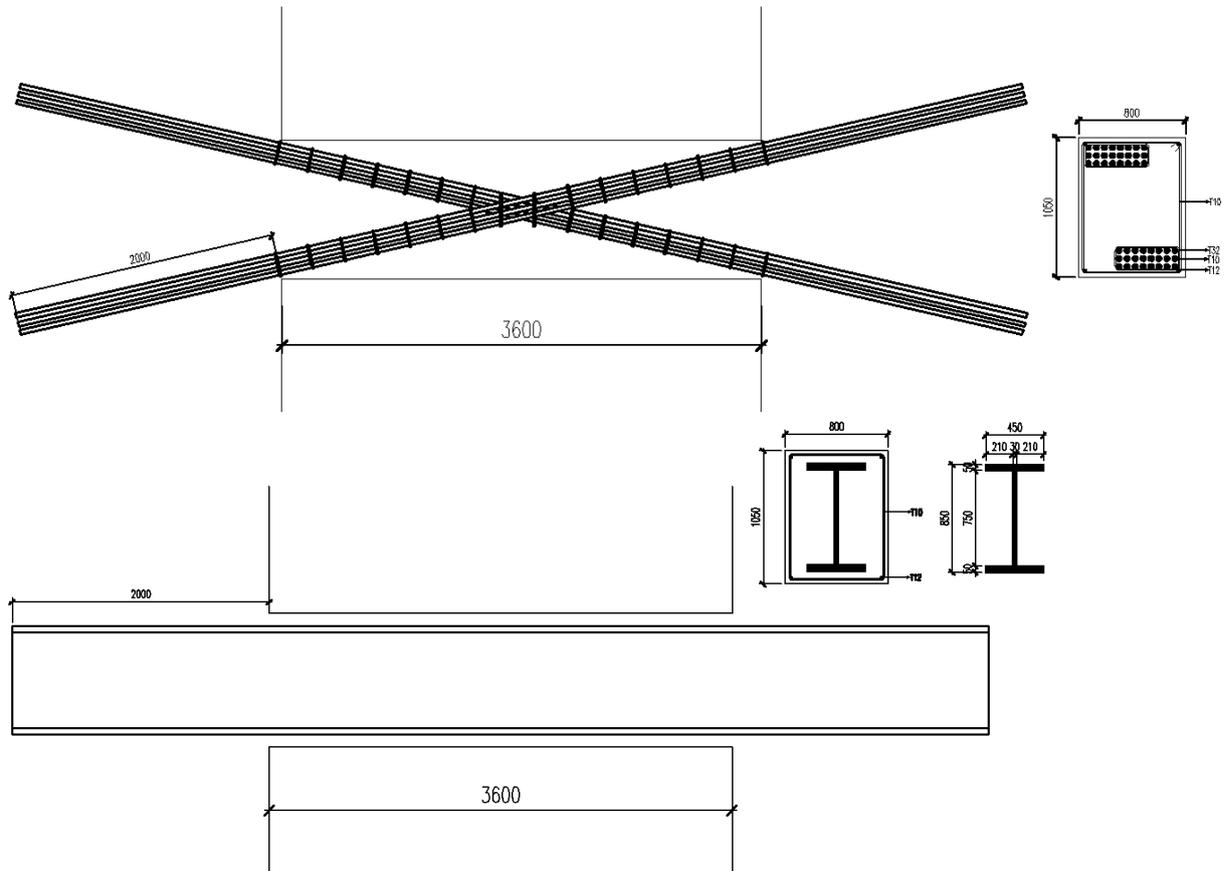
Design results of coupling beam alternatives (a) congestion of rebars in diagonally-reinforced case and (b) concrete encased built-up steel section
